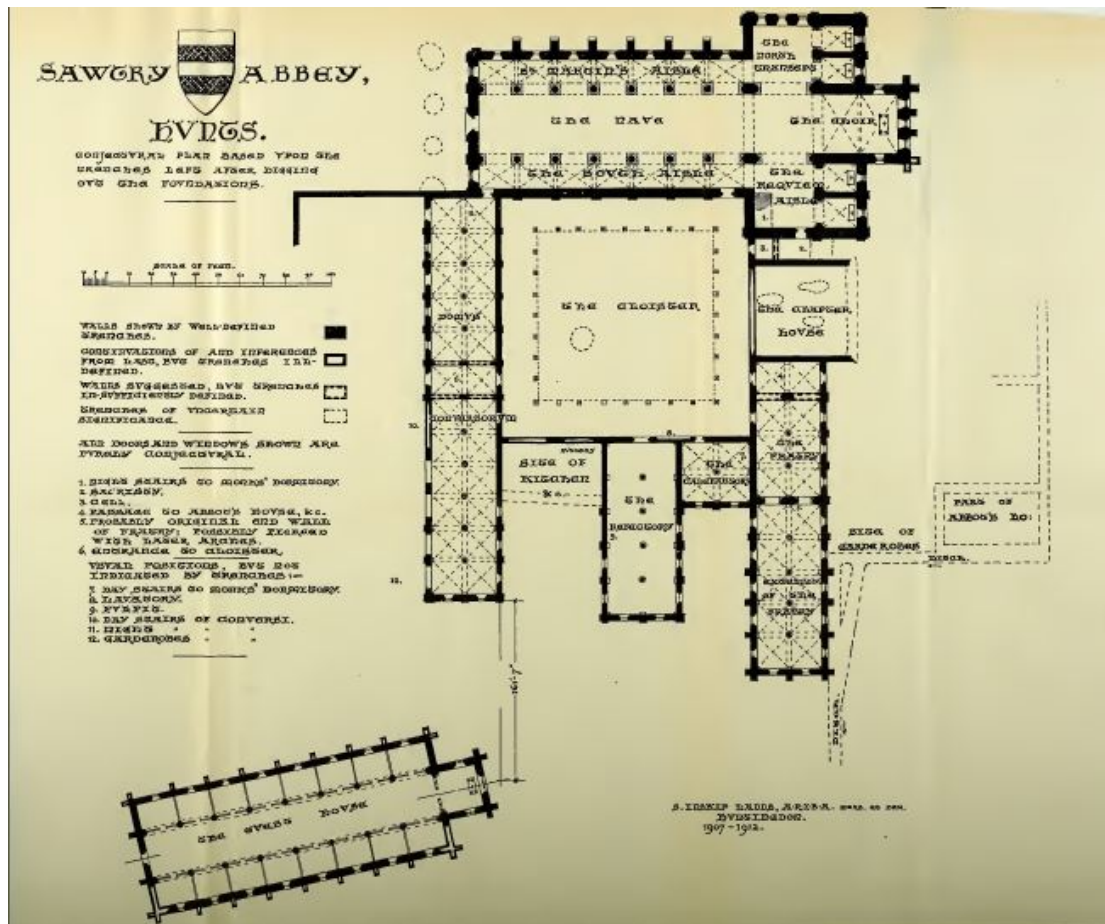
Abbey Plan (Inskip Ladds, 1913)
